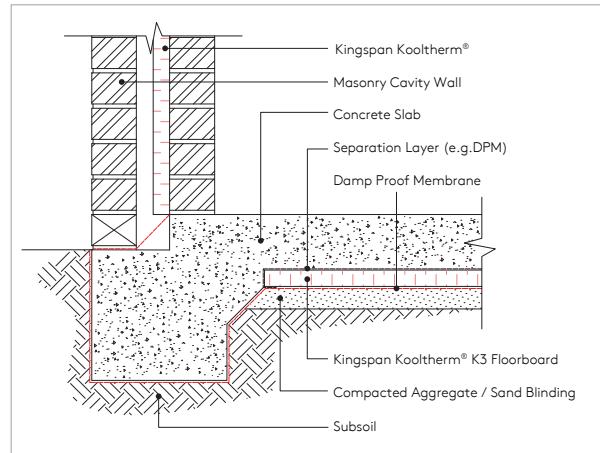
Side elevation - Cavity Wall on Ground Floor Slab with Kingspan Kooltherm® K3 Floorboard
